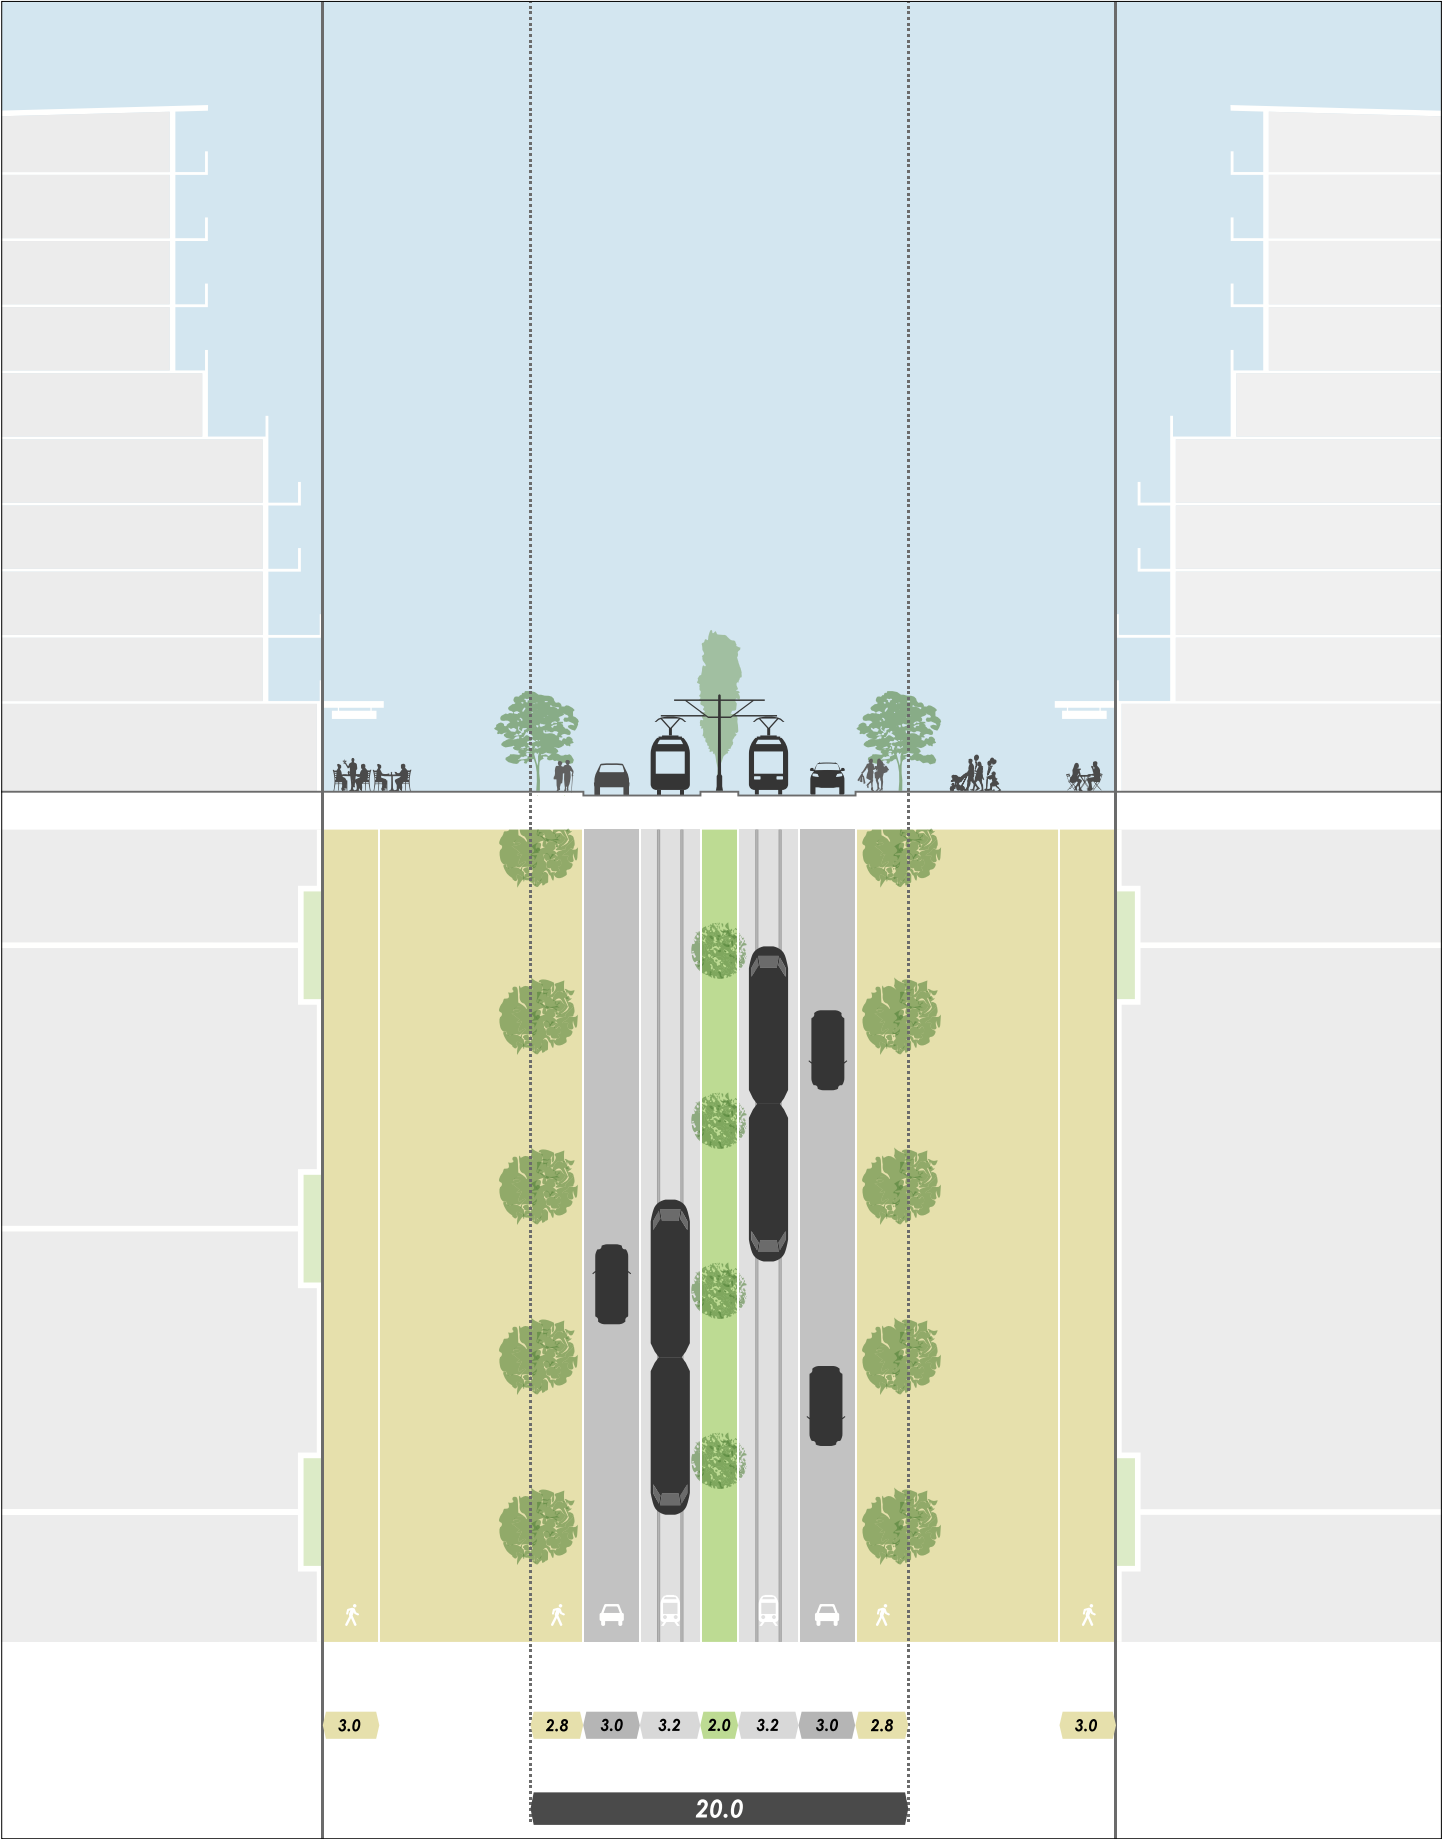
Scarborough Beach Road - Short Term - Light Rail
